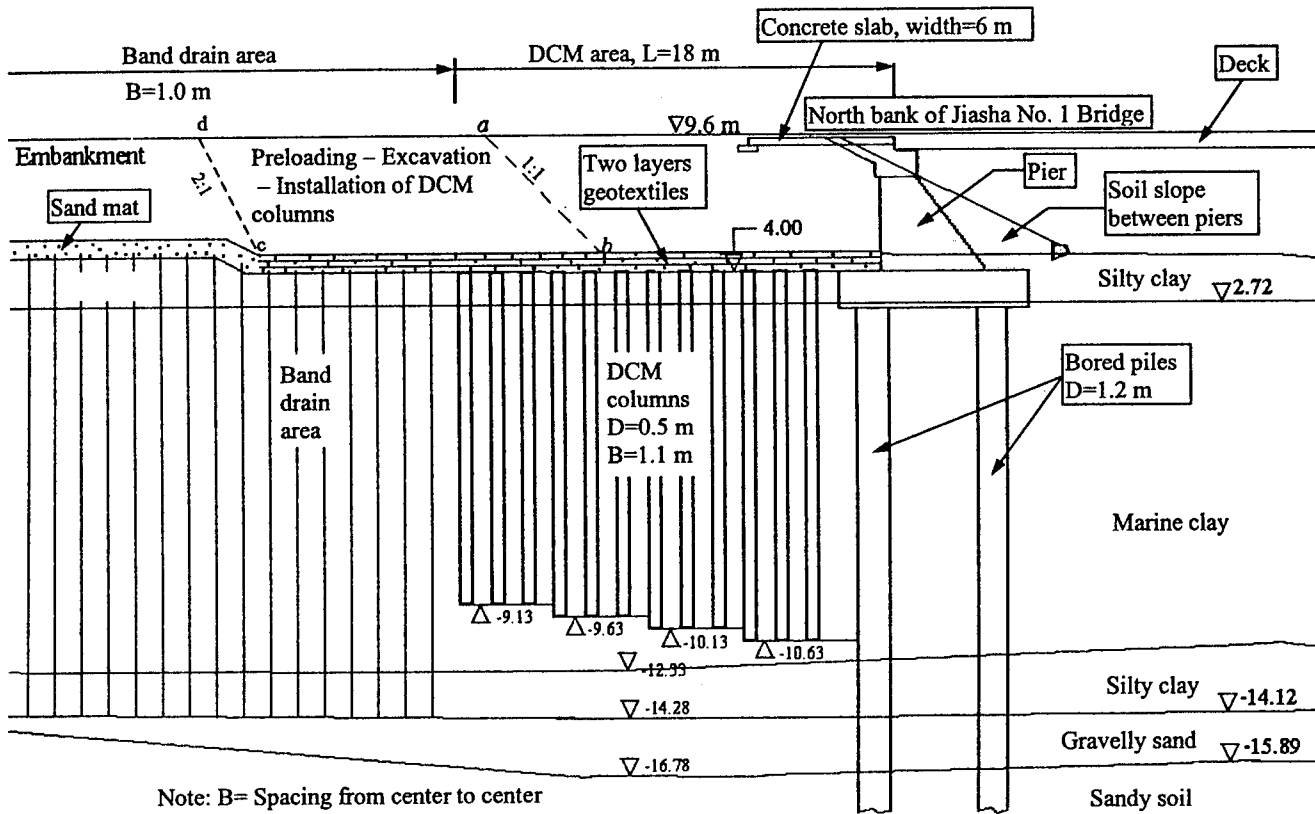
Elevation view of North Approach at Jiasha No. 1 Bridge (Lin et al., 1999).
